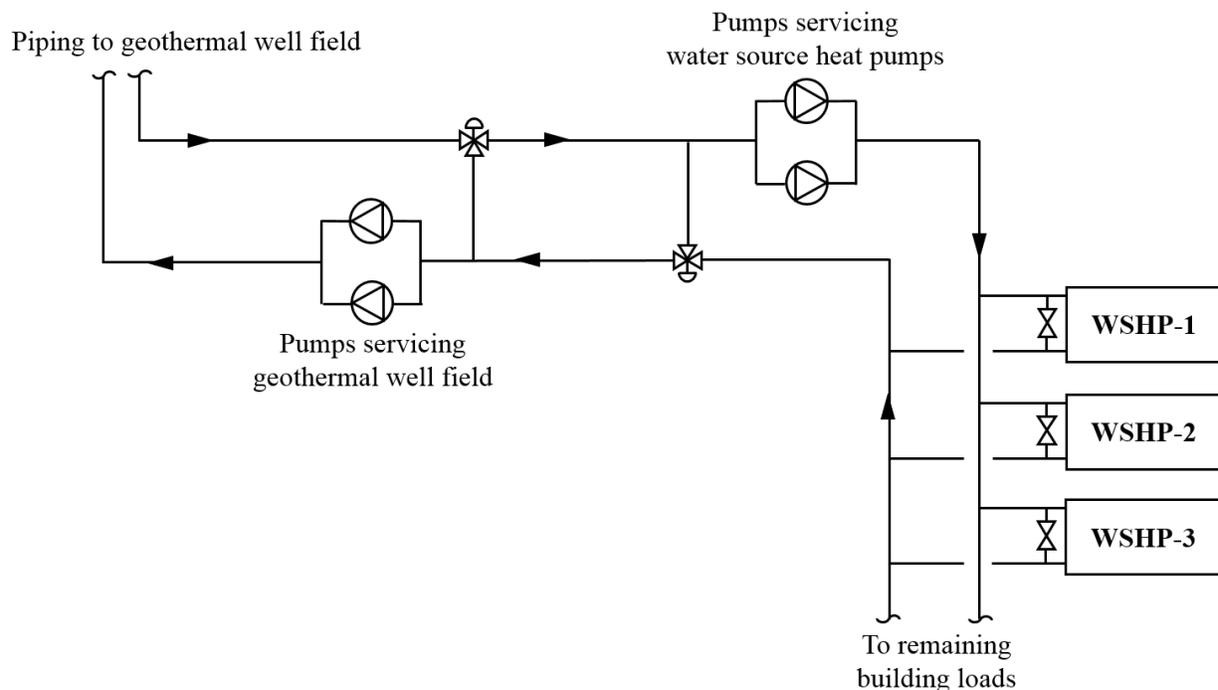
A schematic of the piping arrangement in the Gaige Building's proposed geothermal design
